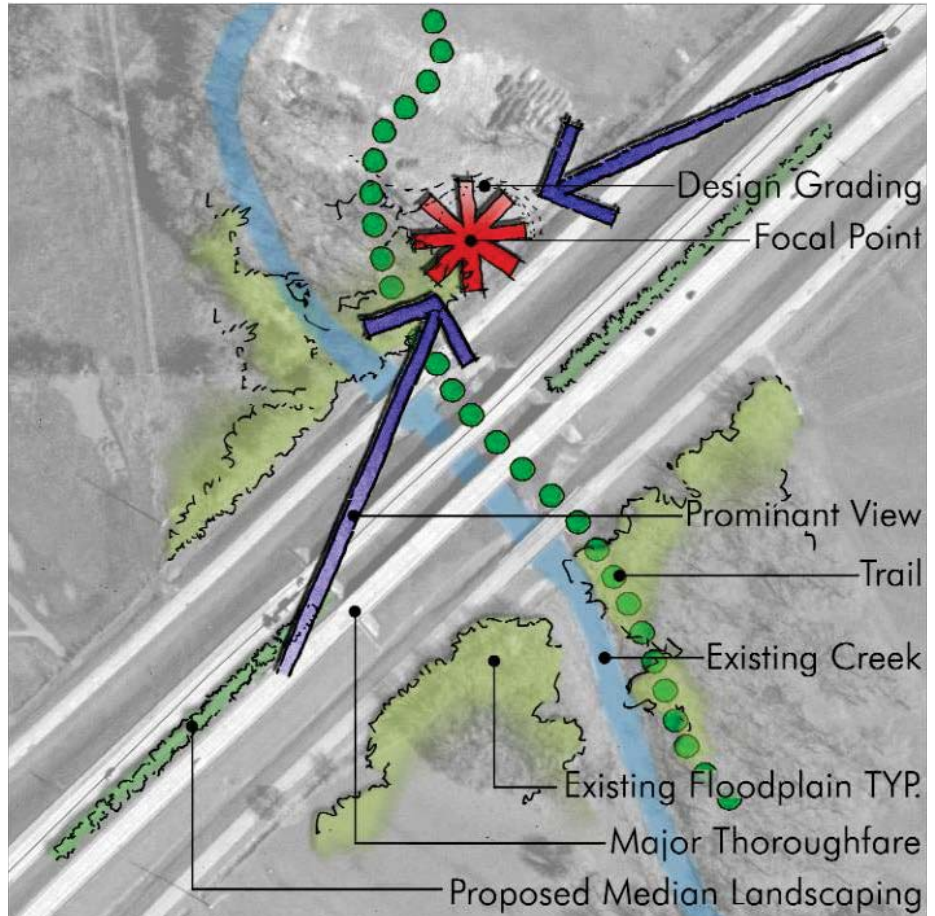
Prototypical McKinney Gateway Concept Plan
